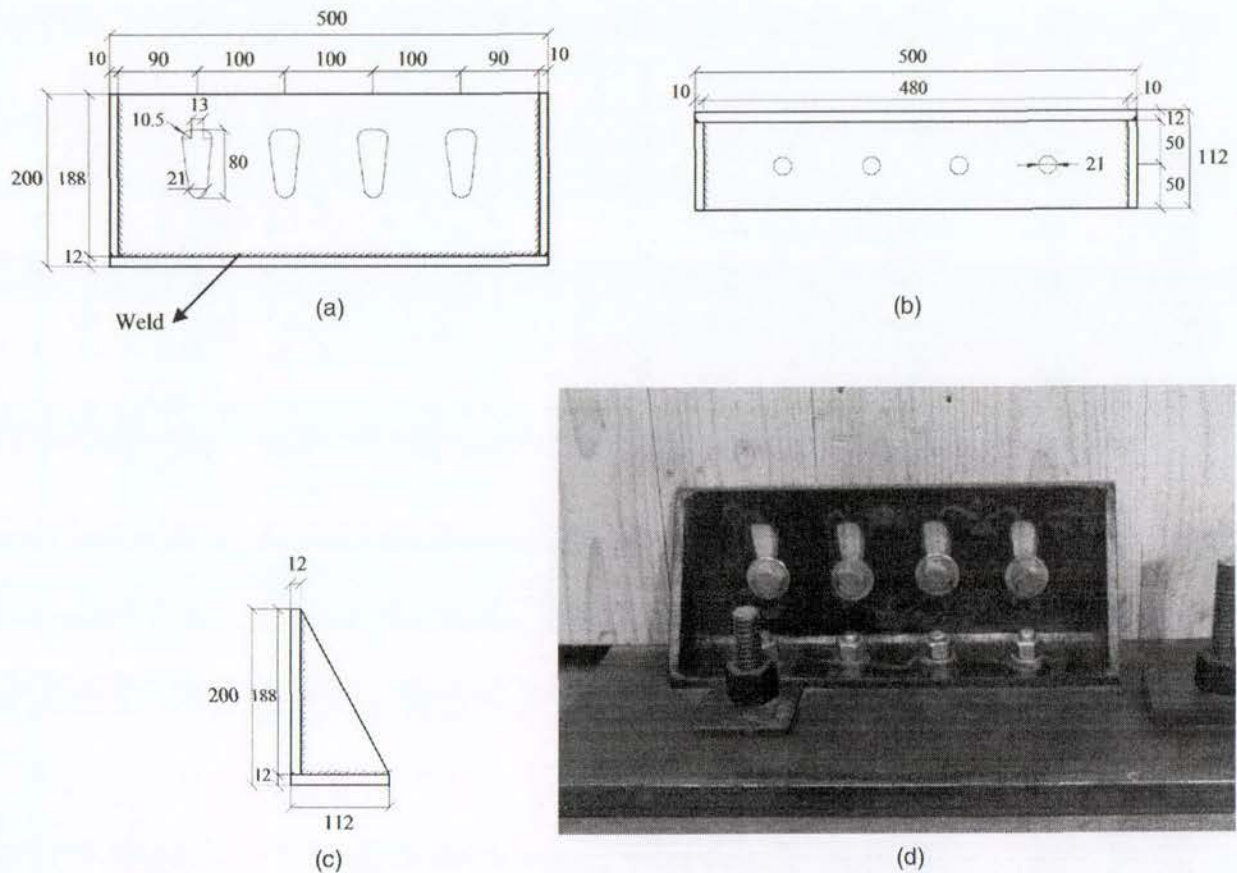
Shear key [data from New Zealand Patent No. 728725 (2017)] (dimensions in millimeters): (a) front view; (b) top view; (c) side view; (d) image of the device
